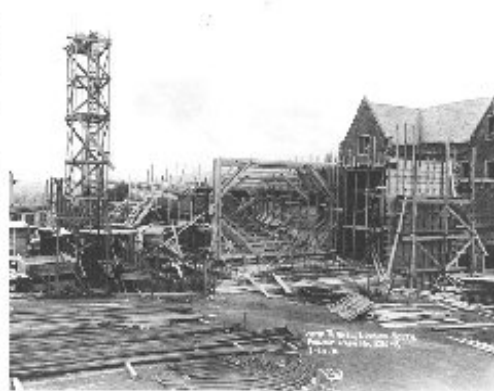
The Kirsten Wind Tunnel under construction, March 1936.
